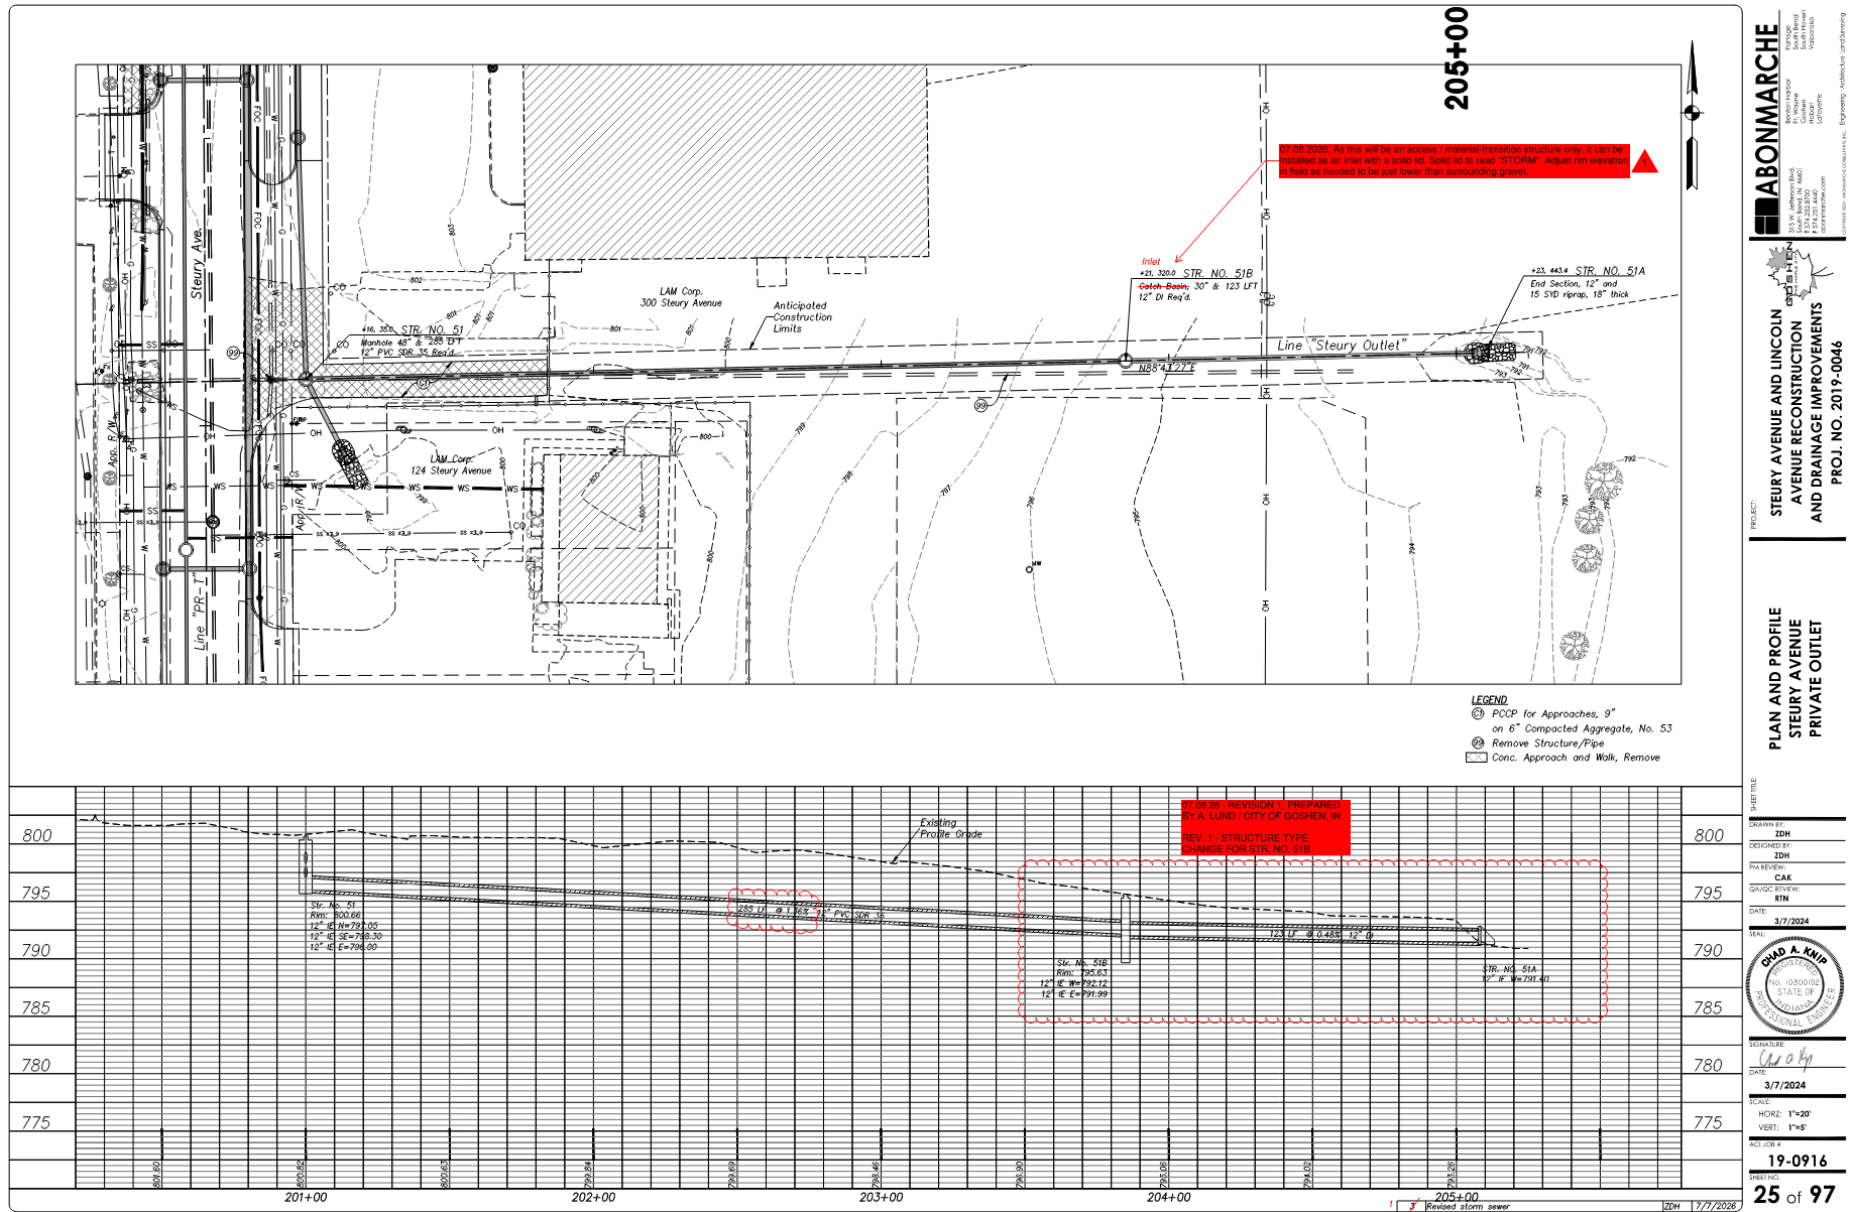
Revised Storm Pipe and Outfall at GDC (300 Steury Avenue)
